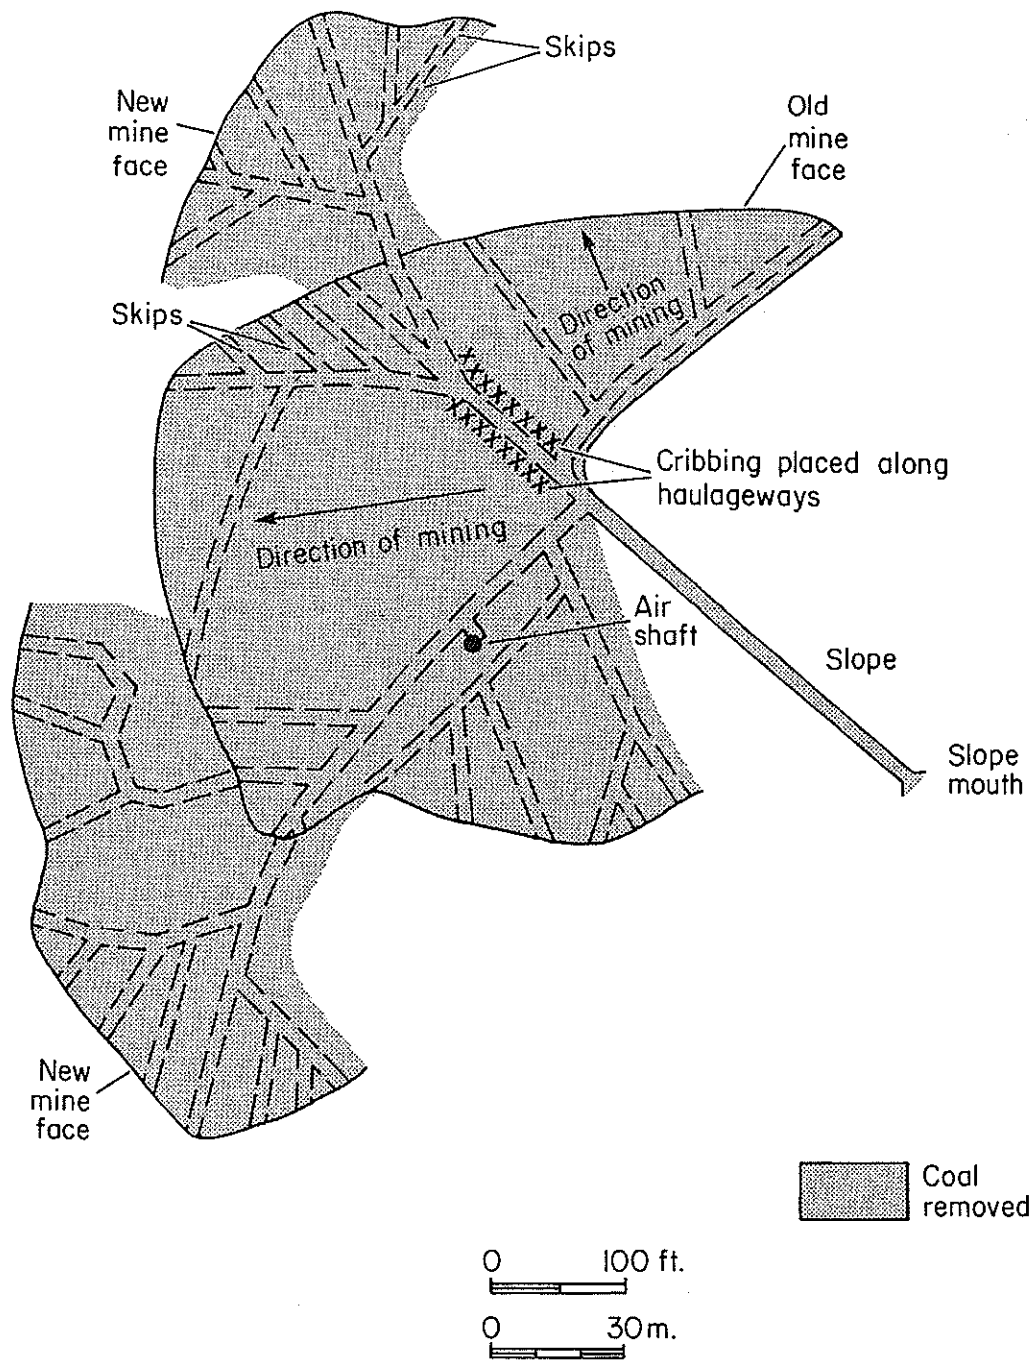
Features of a longwall mine, a method used by a few mines in the Des Moines area where the coal was thin and the roof rock was stable. Nearly 100% of the coal was removed allowing the mine roof to collapse soon after mining. Cribbing (artificial roof support) was installed along the main haulageways to keep them open.
